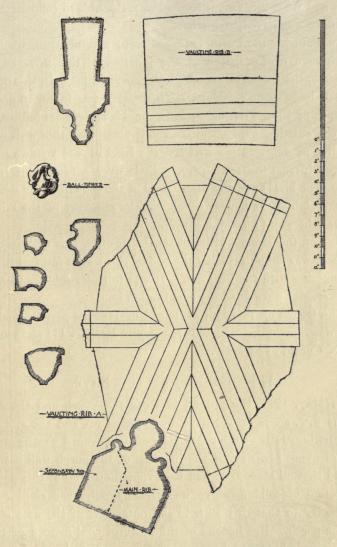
Details of Stonework (fragments), found on Site of North Porch, Glastonbury Abbey.
